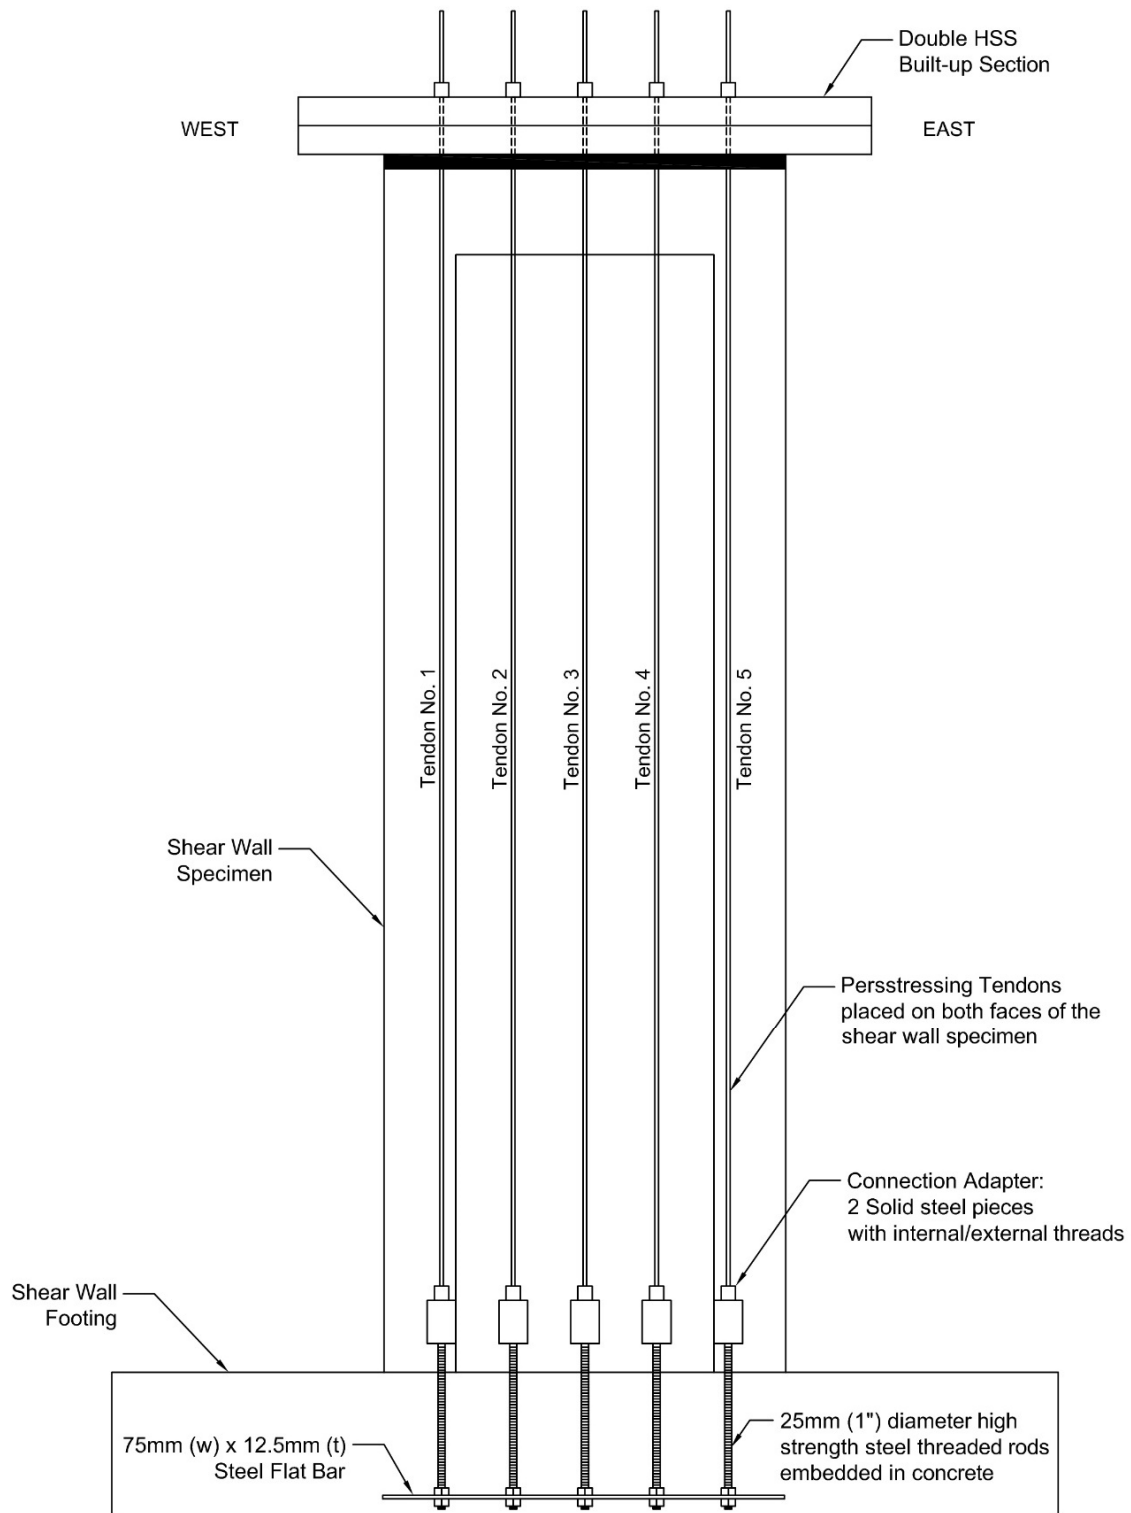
Shear Wall No.3 – Prestressing Tendon Layout
